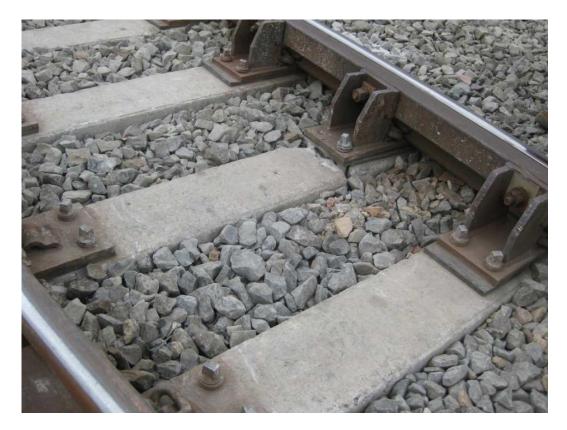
Damage of concrete bearer (3.5-4m) underneath a v-crossing panel
